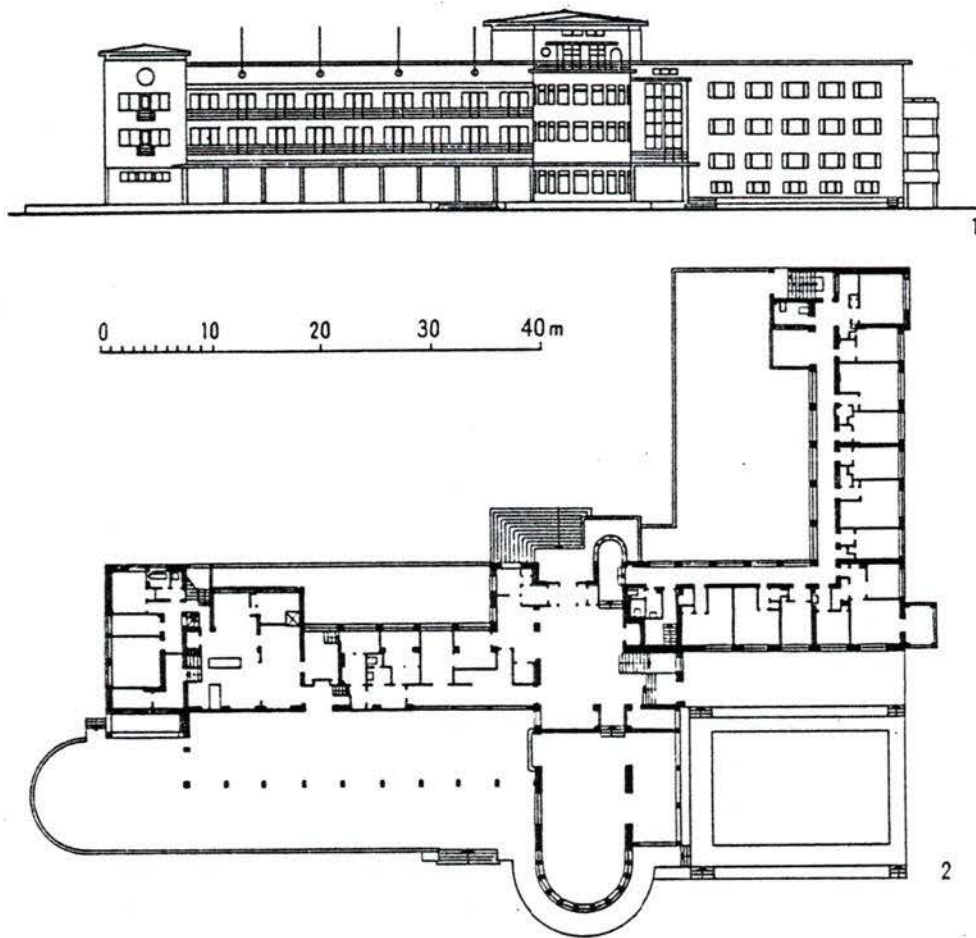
The Rannahotell, Pärnu. Façade and floor plan.
